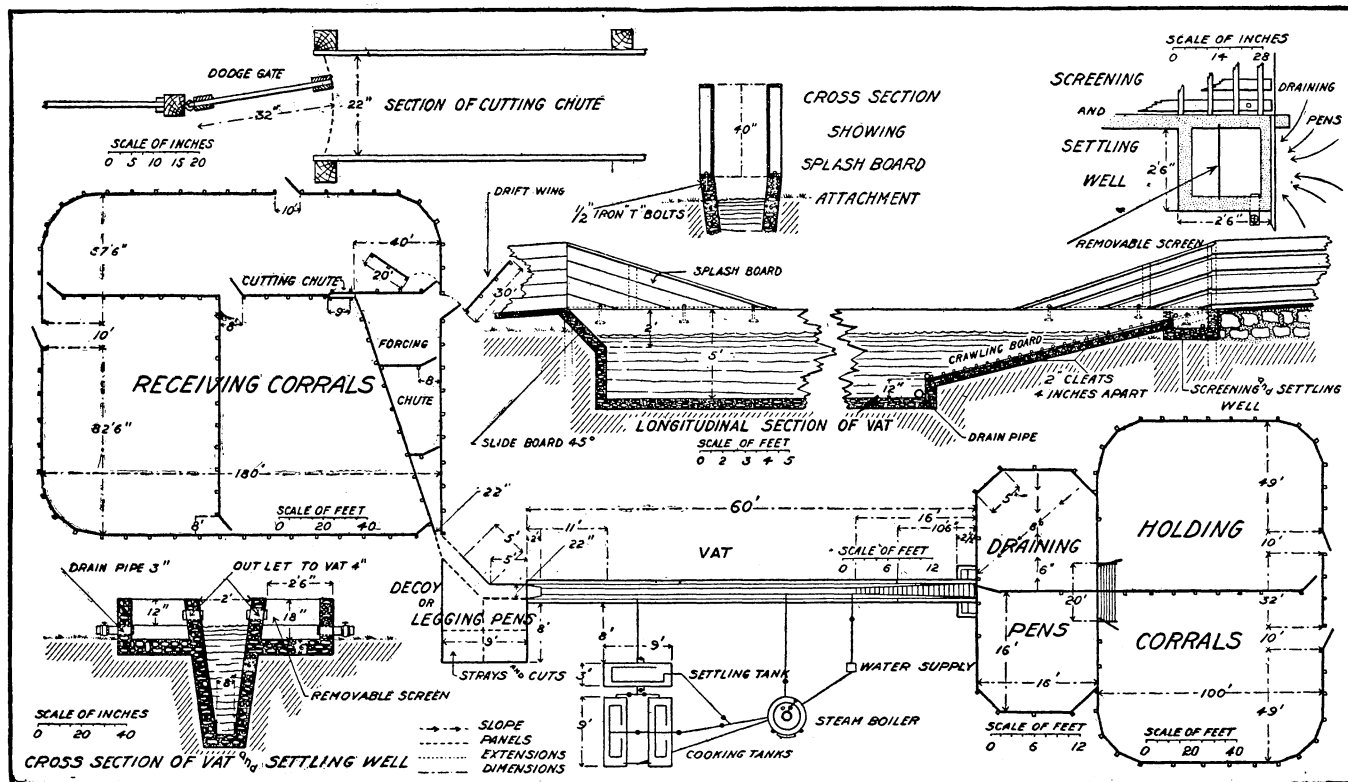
Plan of sheep-dipping plant; concrete vat
